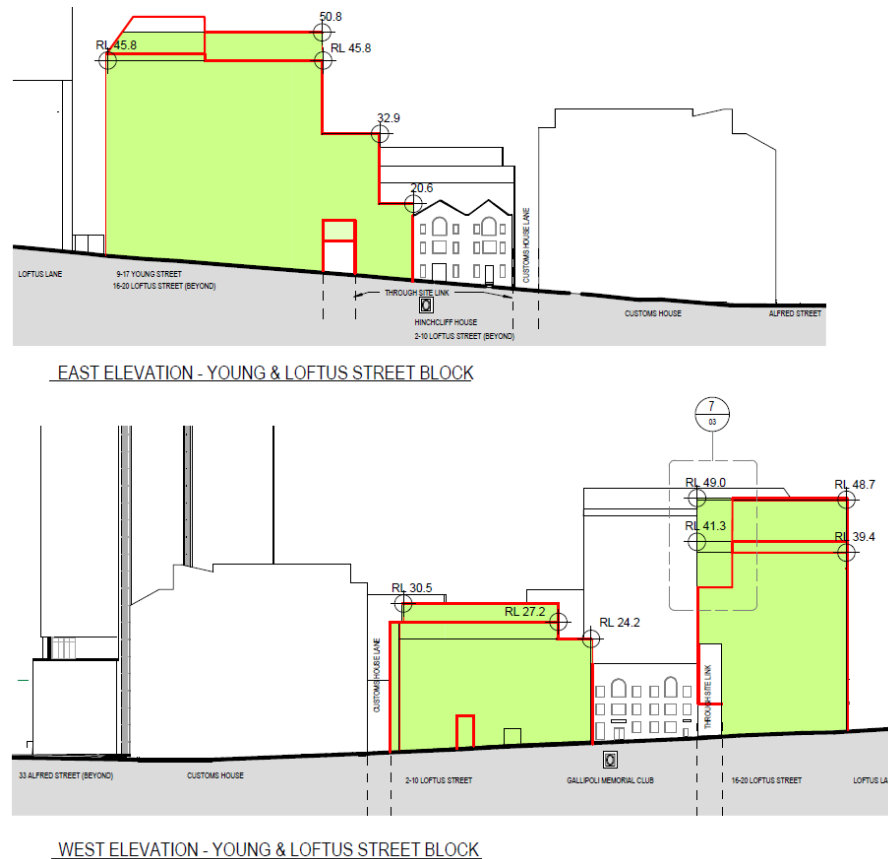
Stage 1 consent – building envelopes – Young and Loftus Street block
